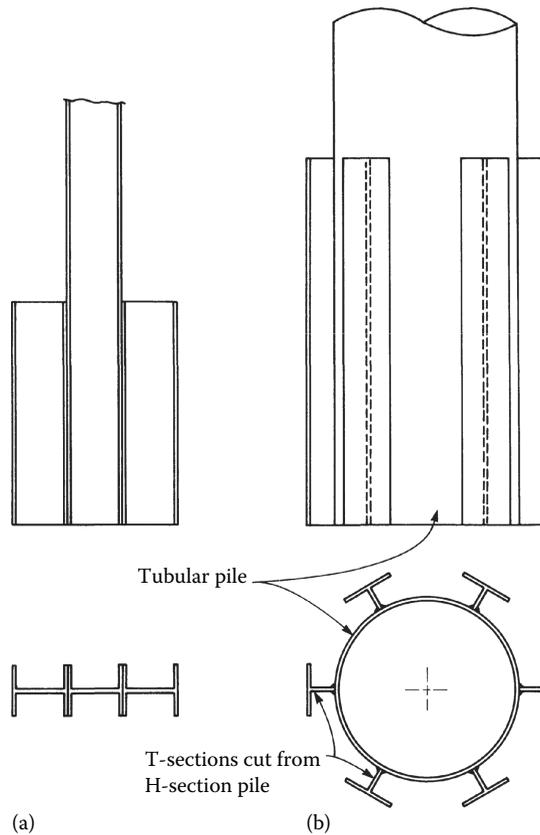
Increasing the bearing capacity of steel piles with welded-on wings (a) H-section wings welded to H-section pile and (b) T-section wings welded to tubular pile.
